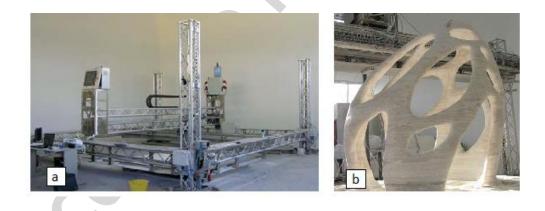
(a) D-shape printer (b) Final printed component with all the excess raw material removed (Dini 2009)
